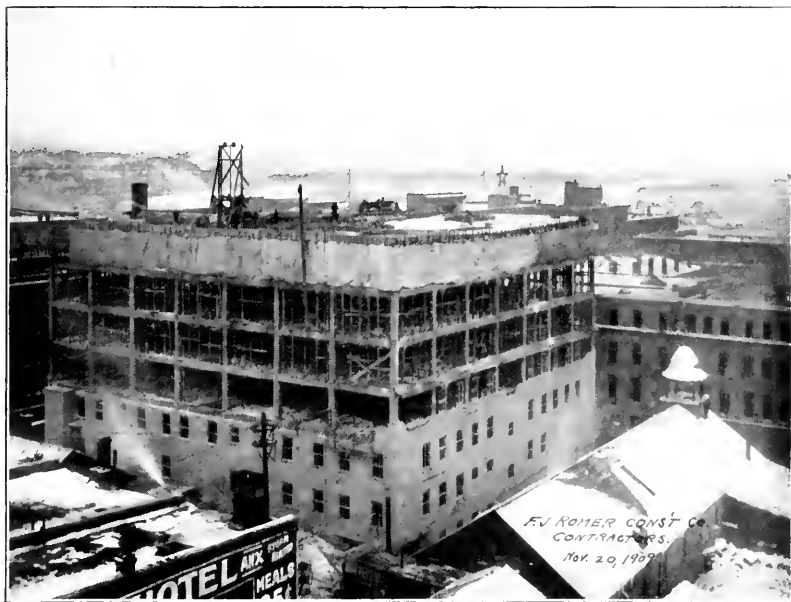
Canvas curtain protecting an upper story of the Strong-Warner Building, St. Paul, under construction in winter.
